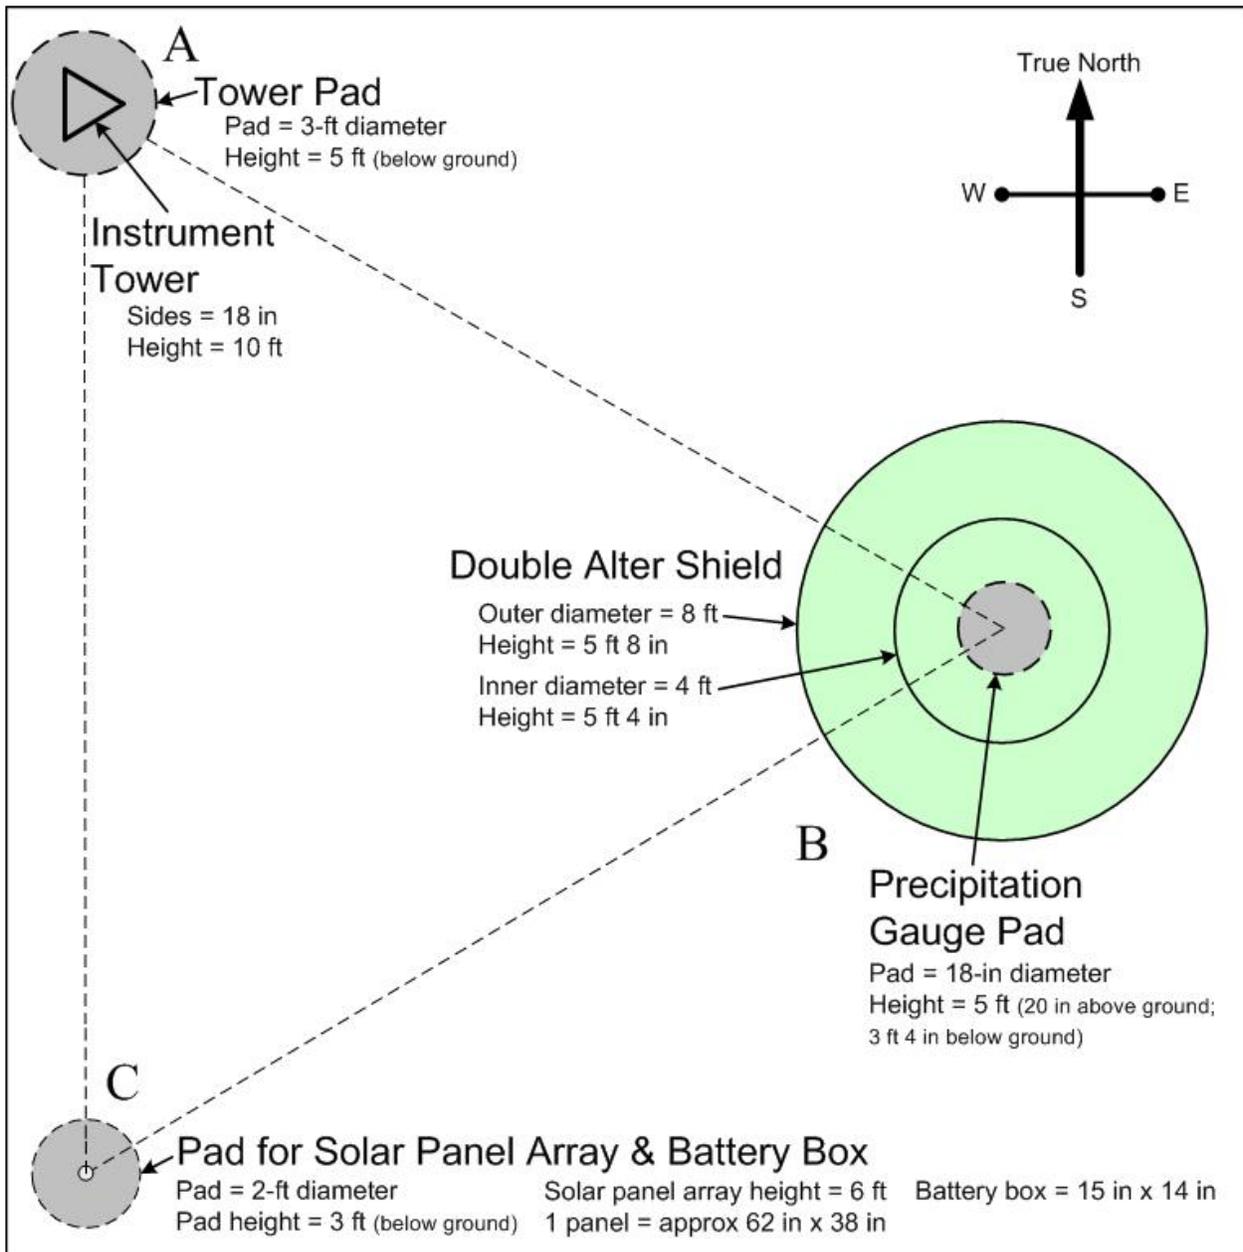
Concrete Pad Layout Orientation (plan view prior to instrument installation)
